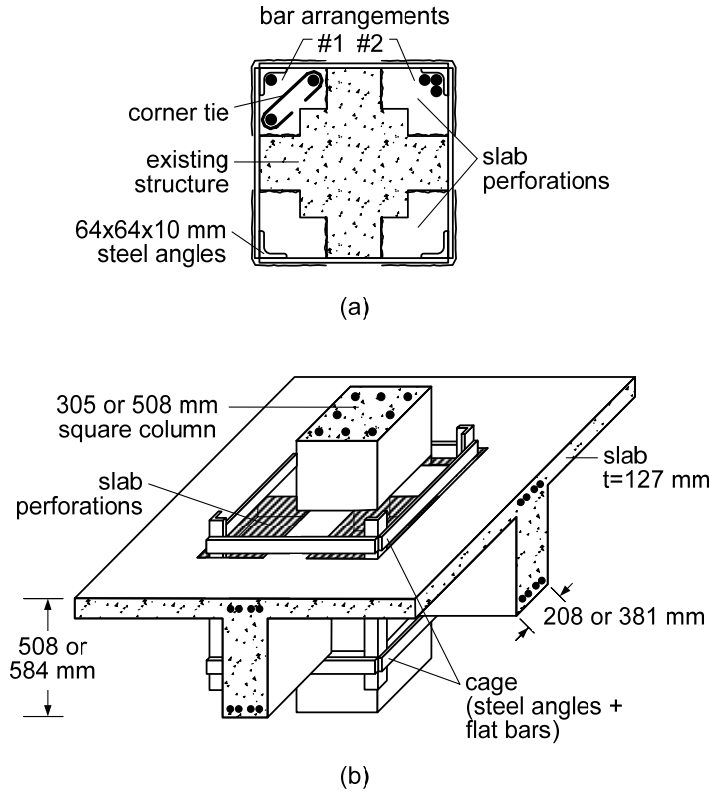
Concrete jacketing technique studied by Alcocer and Jirsa [2.31]:
